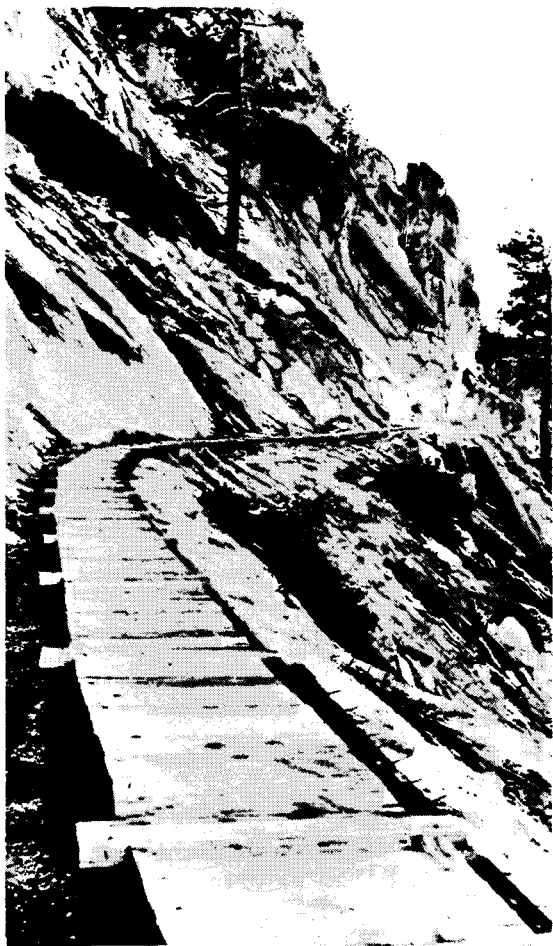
Flume: Marlette Lake to west portal of tunnel, c. 1877.
